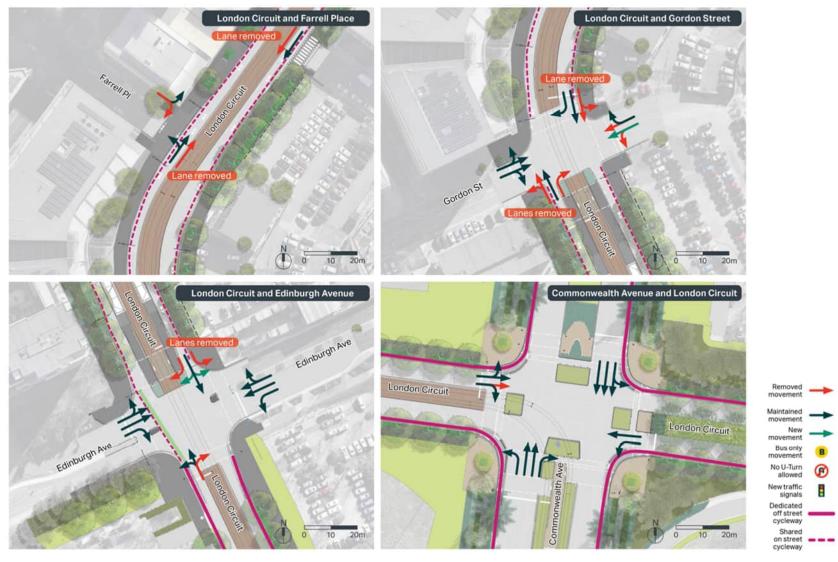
Proposed changes to lanes and intersection configurations – Farrell Place to Commonwealth Avenue
